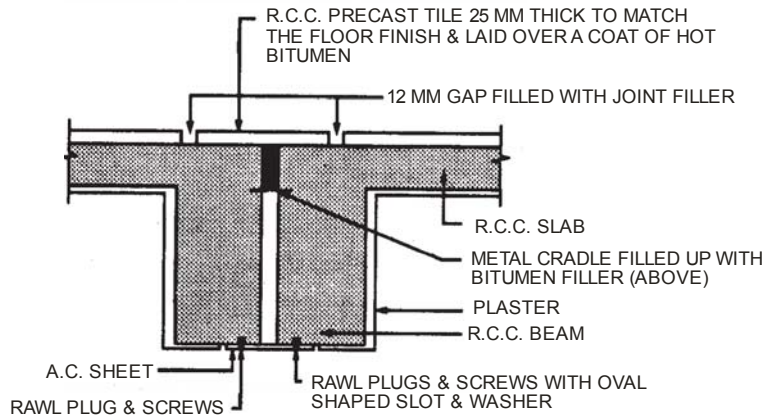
Typical Details of Expansion Joint at Floor
